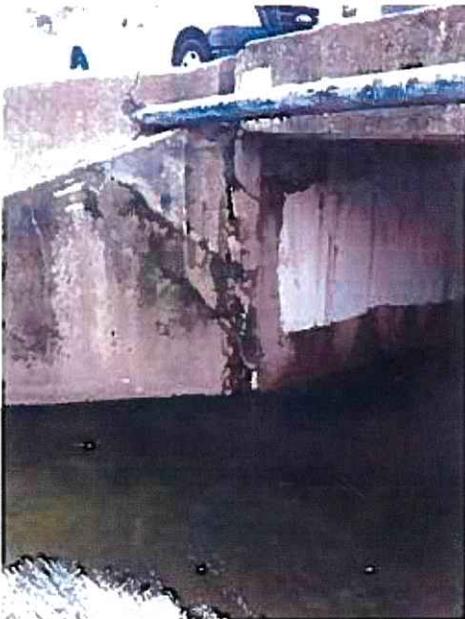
Another picture of the upstream wingwall on the north side. Note the completely rusted rebar.
